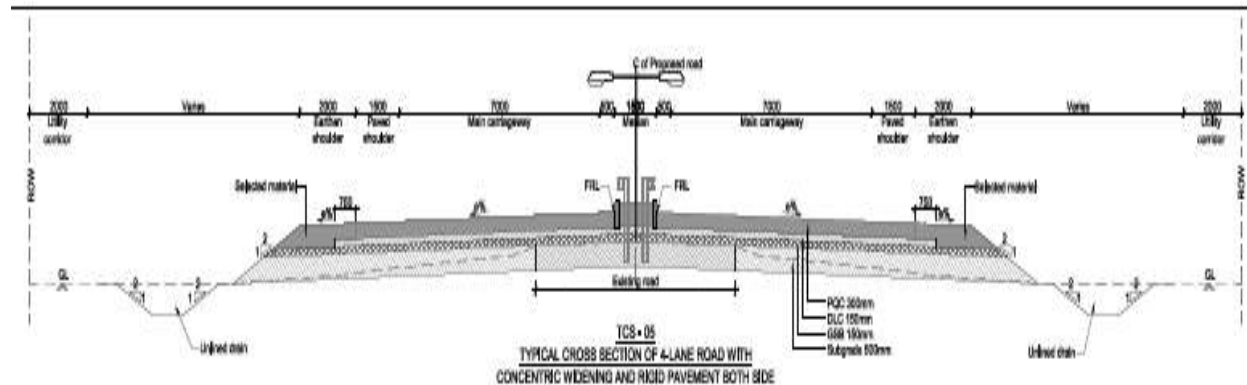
TCS-5 4-lane road for new construction with rigid pavement both side
